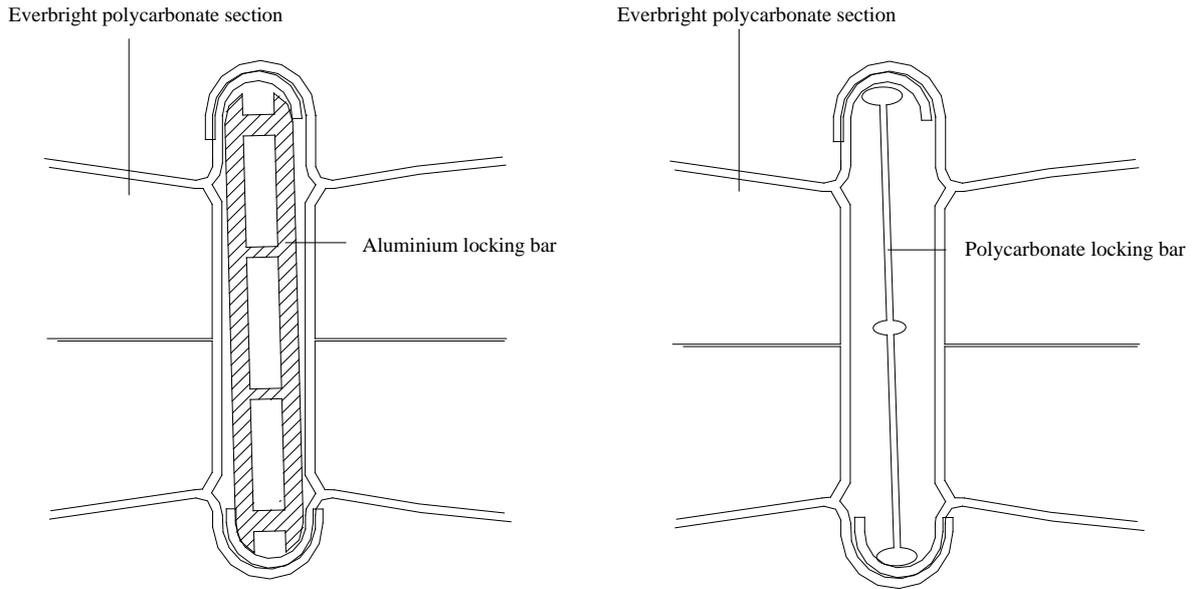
Detail drawings of aluminium (left) and polycarbonate (right) locking bar installations (provided by client)
